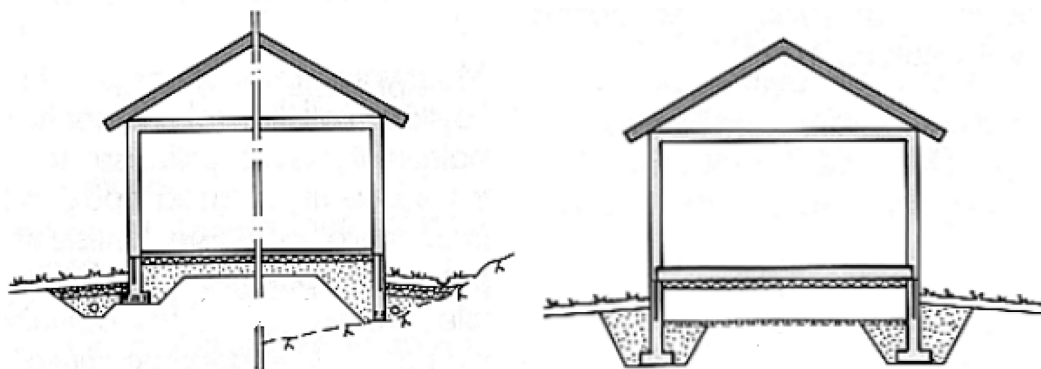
A foundation wall with CFG (left) and foundation wall with self-supported base floor (right) (RT 81-10486, 1992).
